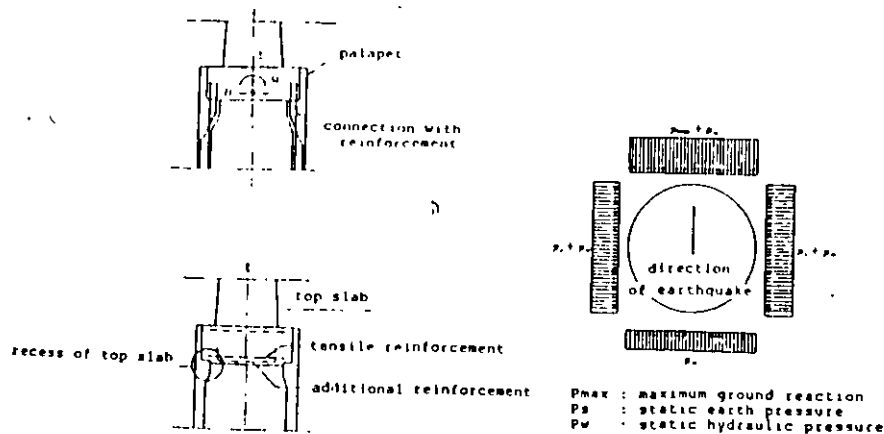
Reinforcement of Caisson Foundation and Design Earthquake Loadings
